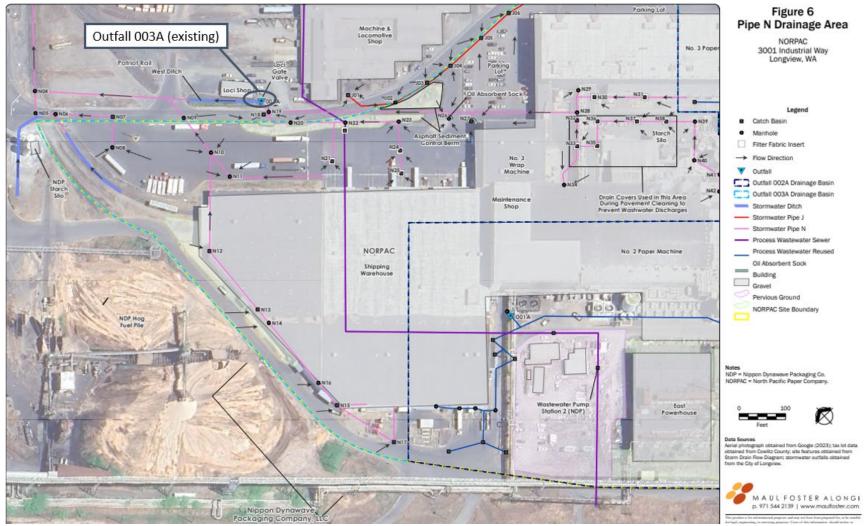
Pipe N drainage basin, and portions of the Pipe J and Pipe B drainage basins, with the approximate location of existing Outfall 003A.
